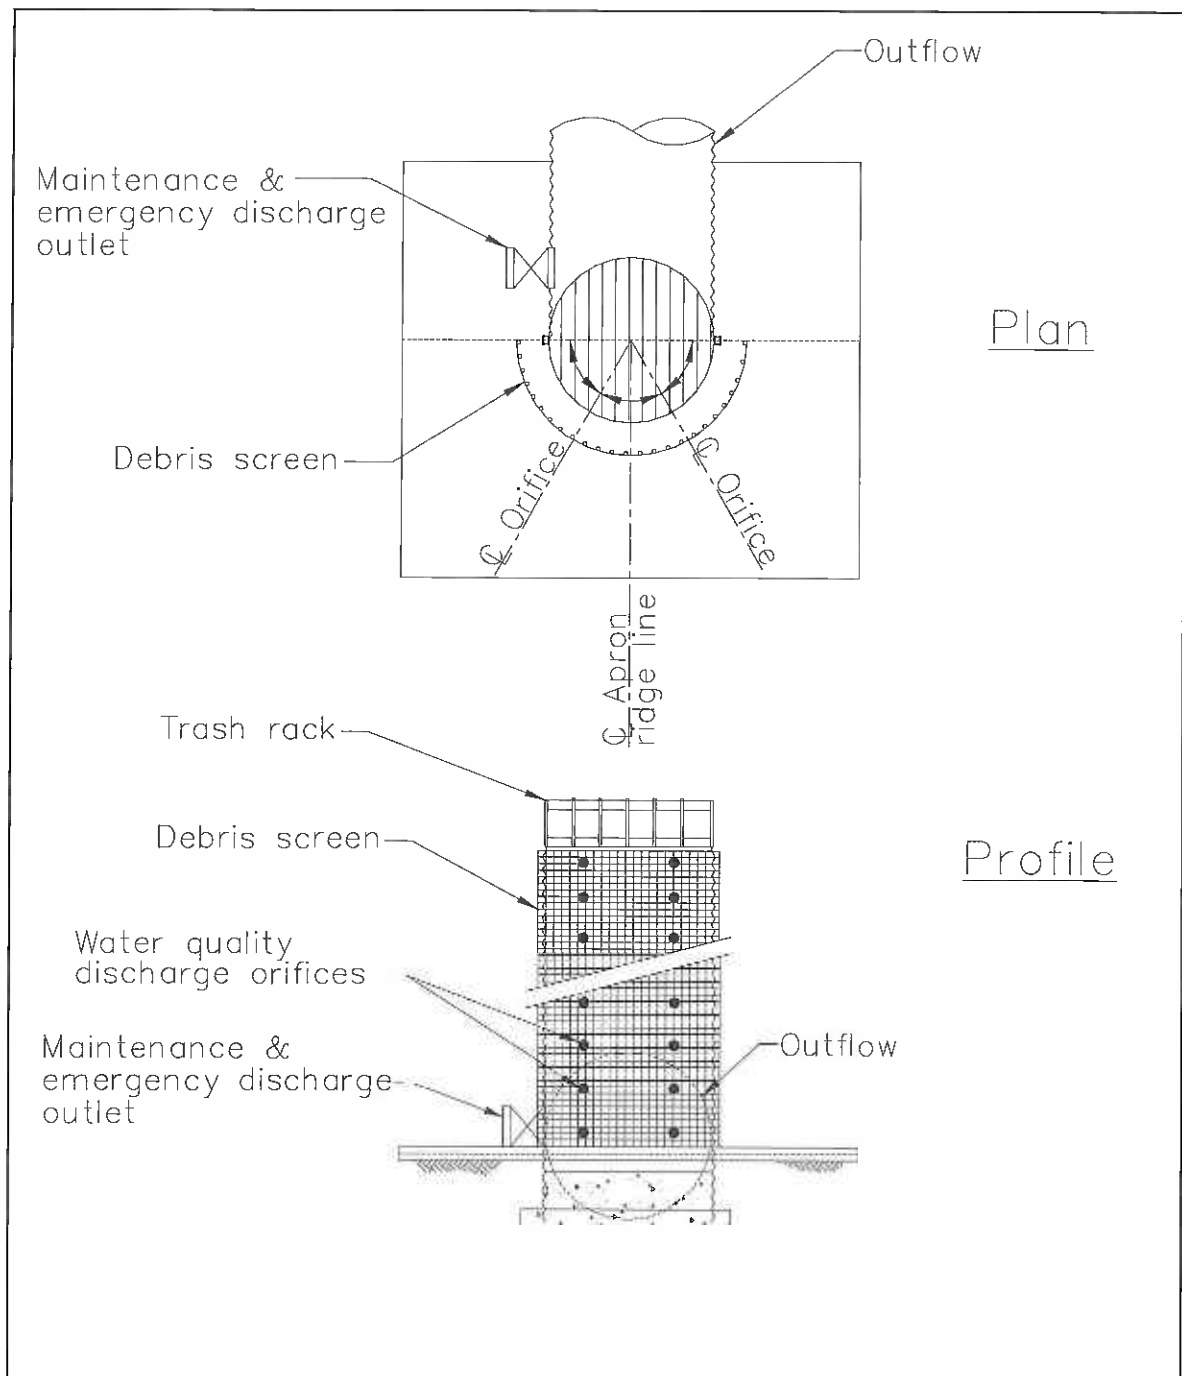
MULTIPLE ORIFICE OUTLET RISER
